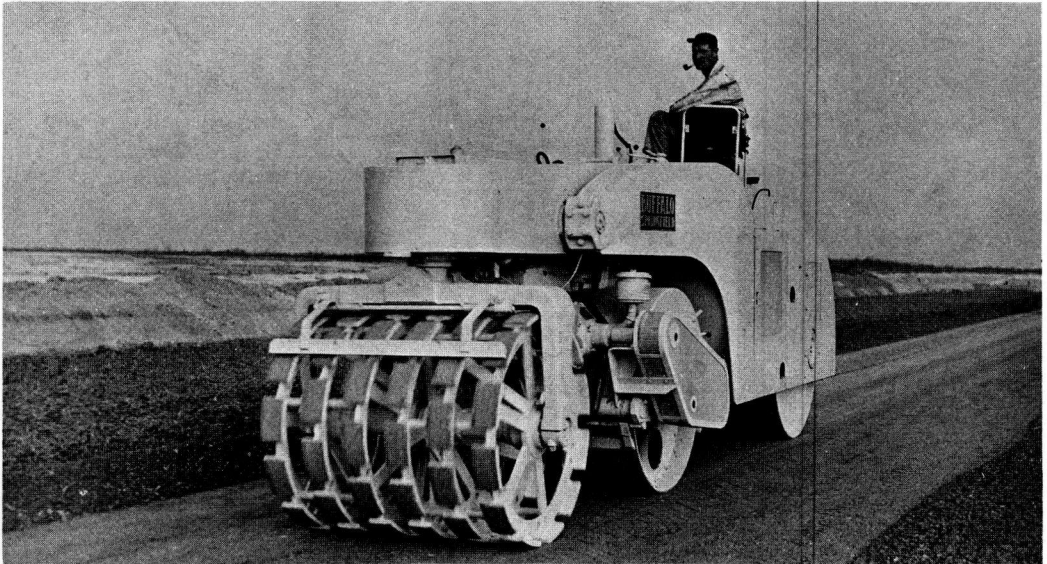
Combination tandem-type roller consisting of a front segmented wheel, a center vibrating smooth-wheel roll and a rear smooth-wheel roll.
